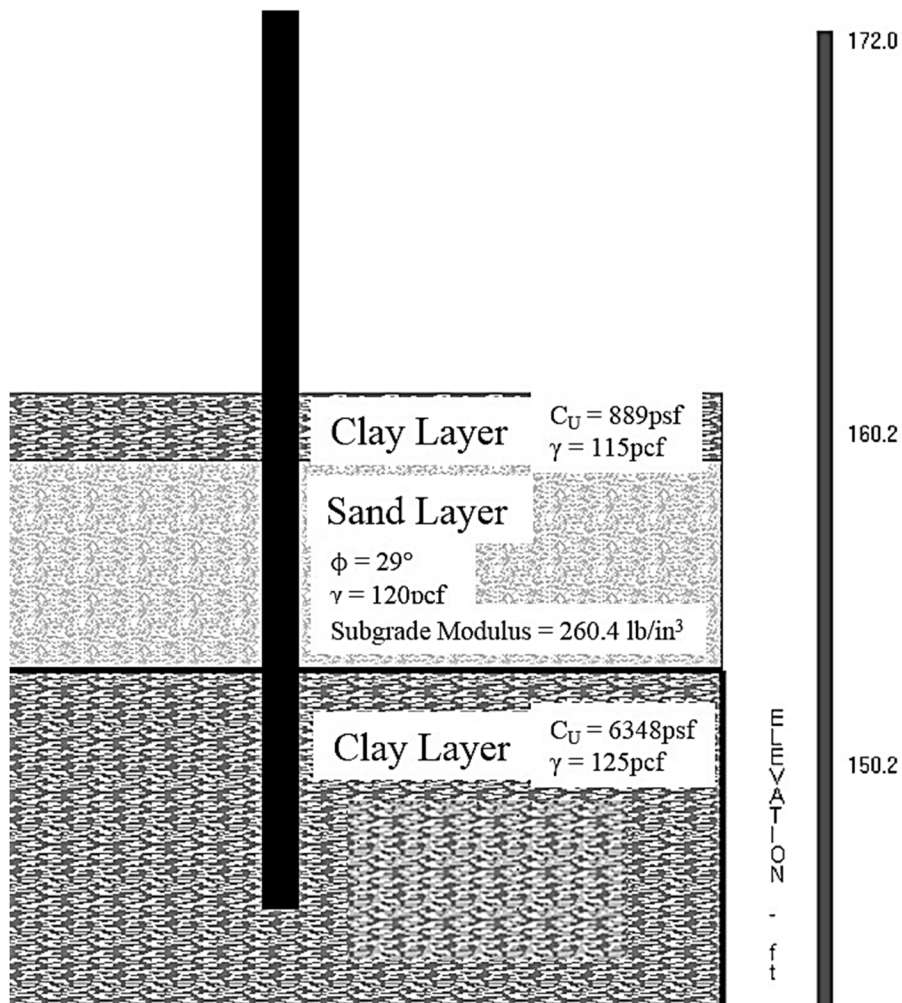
Highway 331 Bridge Soil and Pile Profile (Adapted from FB Multiplier)
